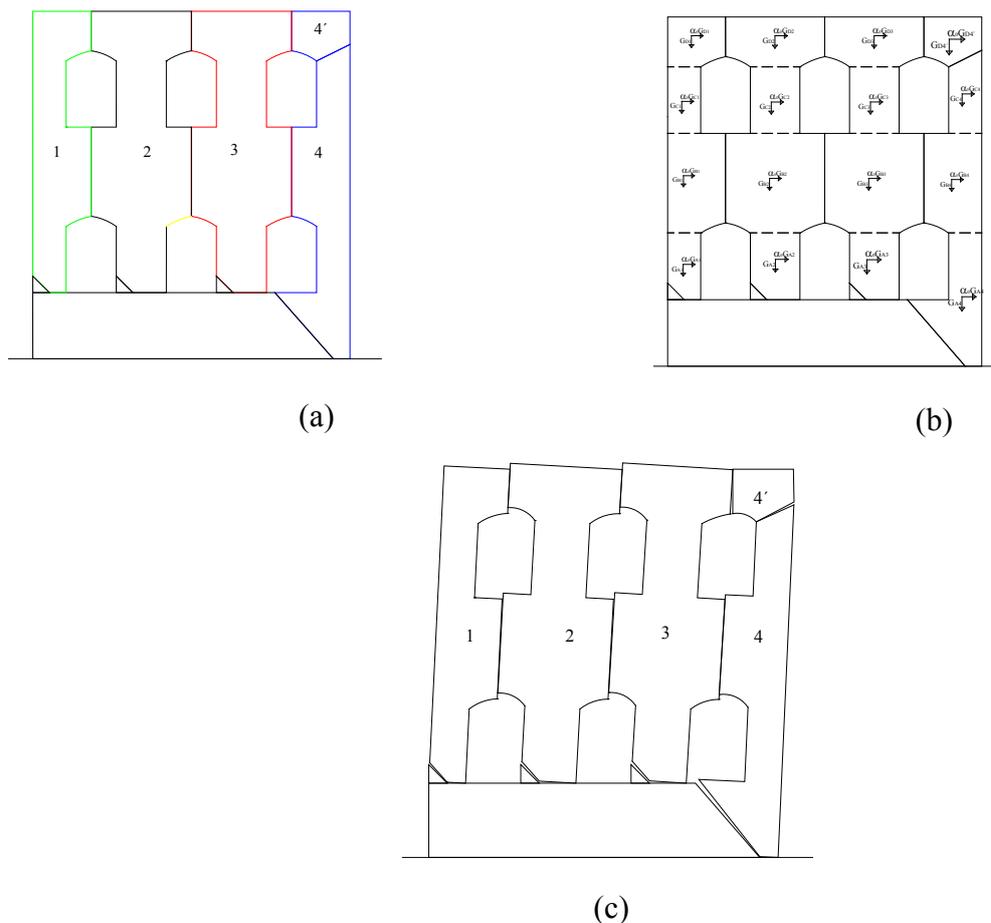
Macro block modelling for masonry wall 2, (a) macro blocks, (b) inertial forces at macro blocks, (c) failure mechanism
